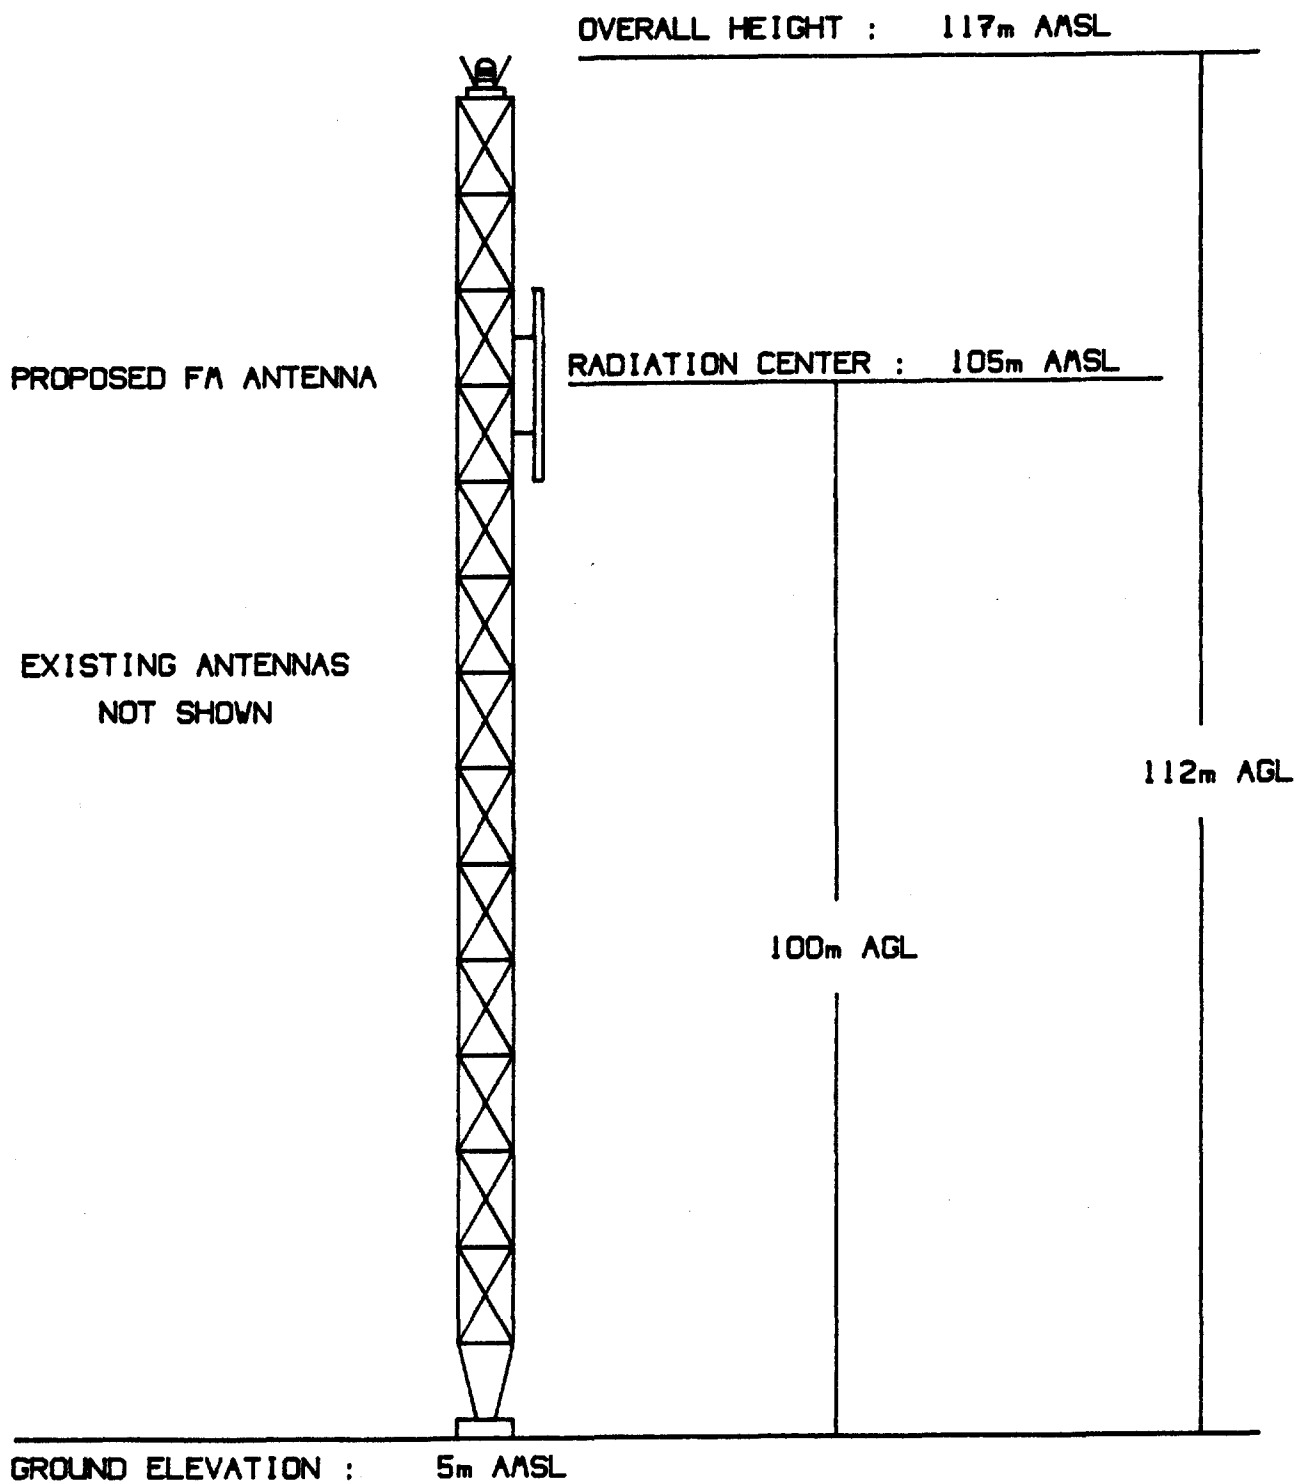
VERTICAL PLAN SKETCH OF PROPOSED
